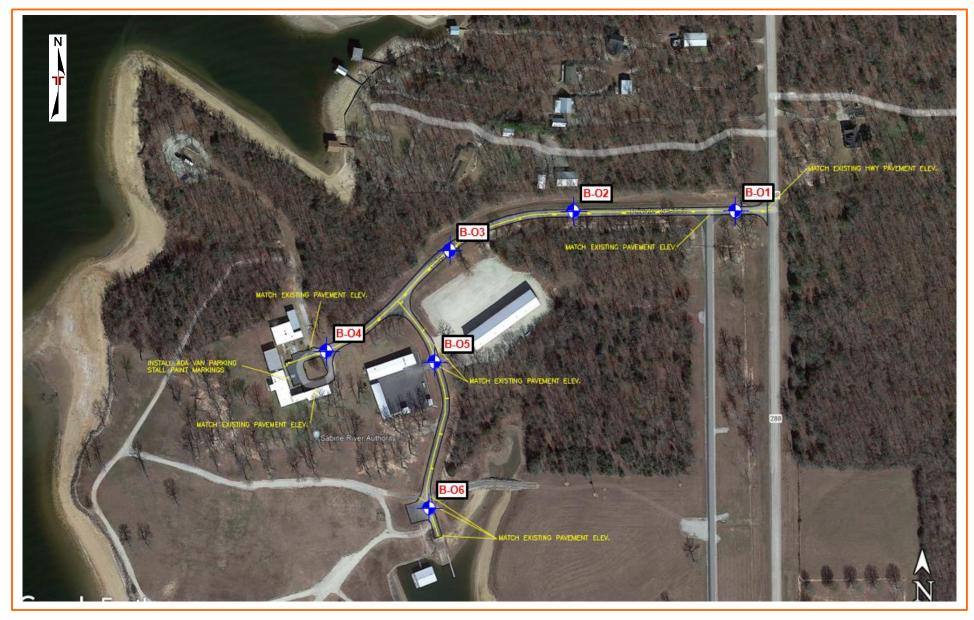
EXHIBIT – EXPLORATION PLAN (SITE NO. 2 - LFD Cabin) Lake Fork Pavement Reconstruction ■ Quitman, Texas February 22, 2023 ■ Terracon Project No. CM235000
